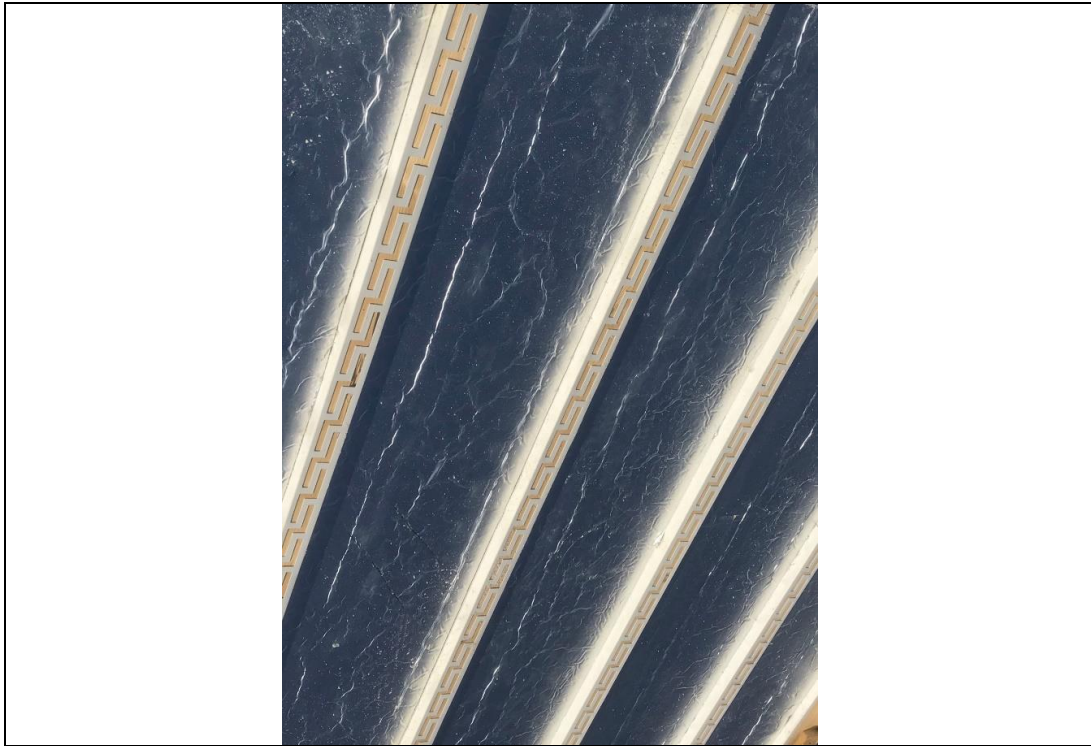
Insulfix Track – installation onto underside of rafters (new build - external view)
